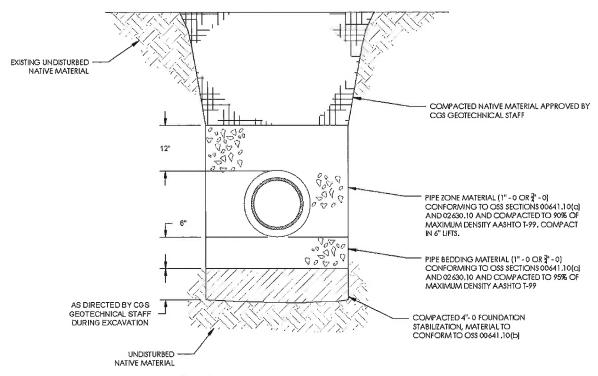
Trench Not in ROW, Under Structure or Pavement, Etc.
